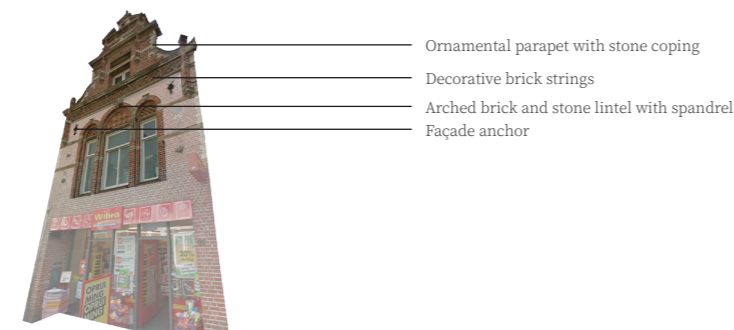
Ginnekenstraat 92 Breda, showing an ornamental parapet with stone coping and arched spandrel above sliding sash windows and façade anchors (Google earth, 2026a, Breda)
